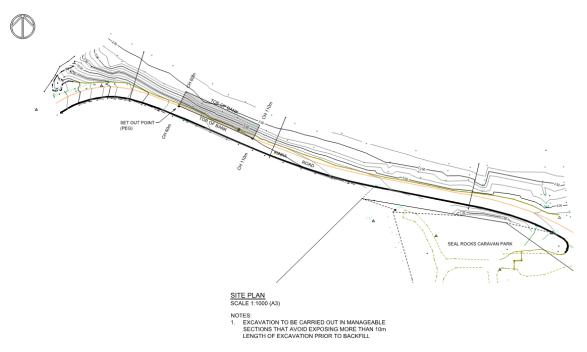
Rockfill batter structure - site plan (Source: RGS, 2014)
